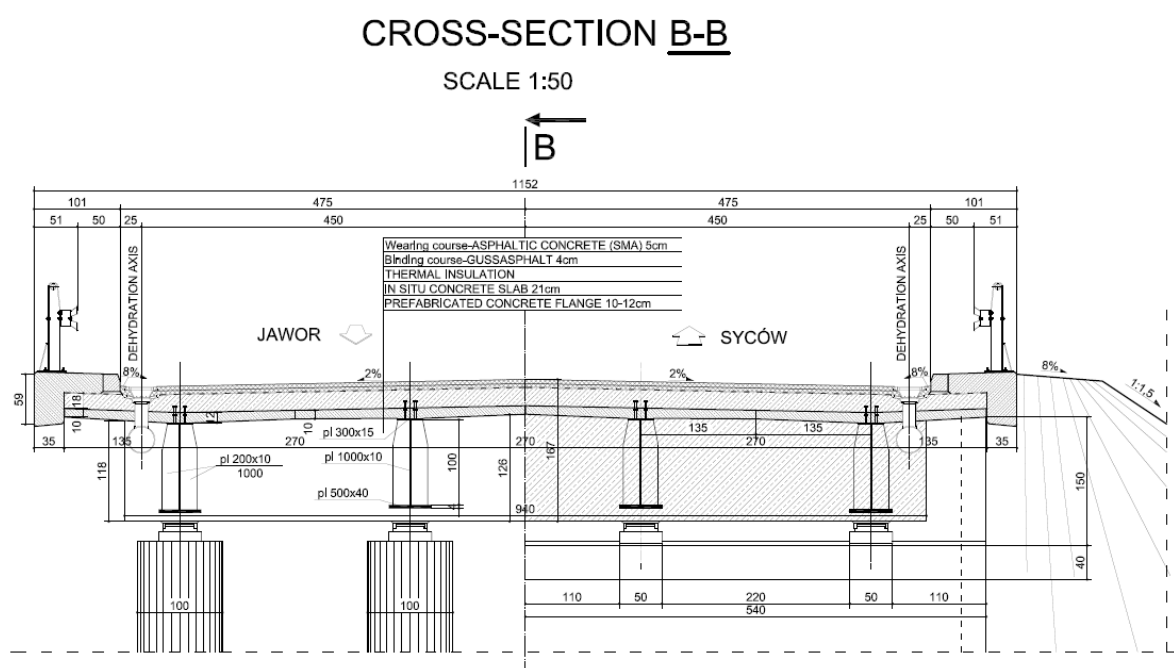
Cross-section consisting of 4 VFT girders.
